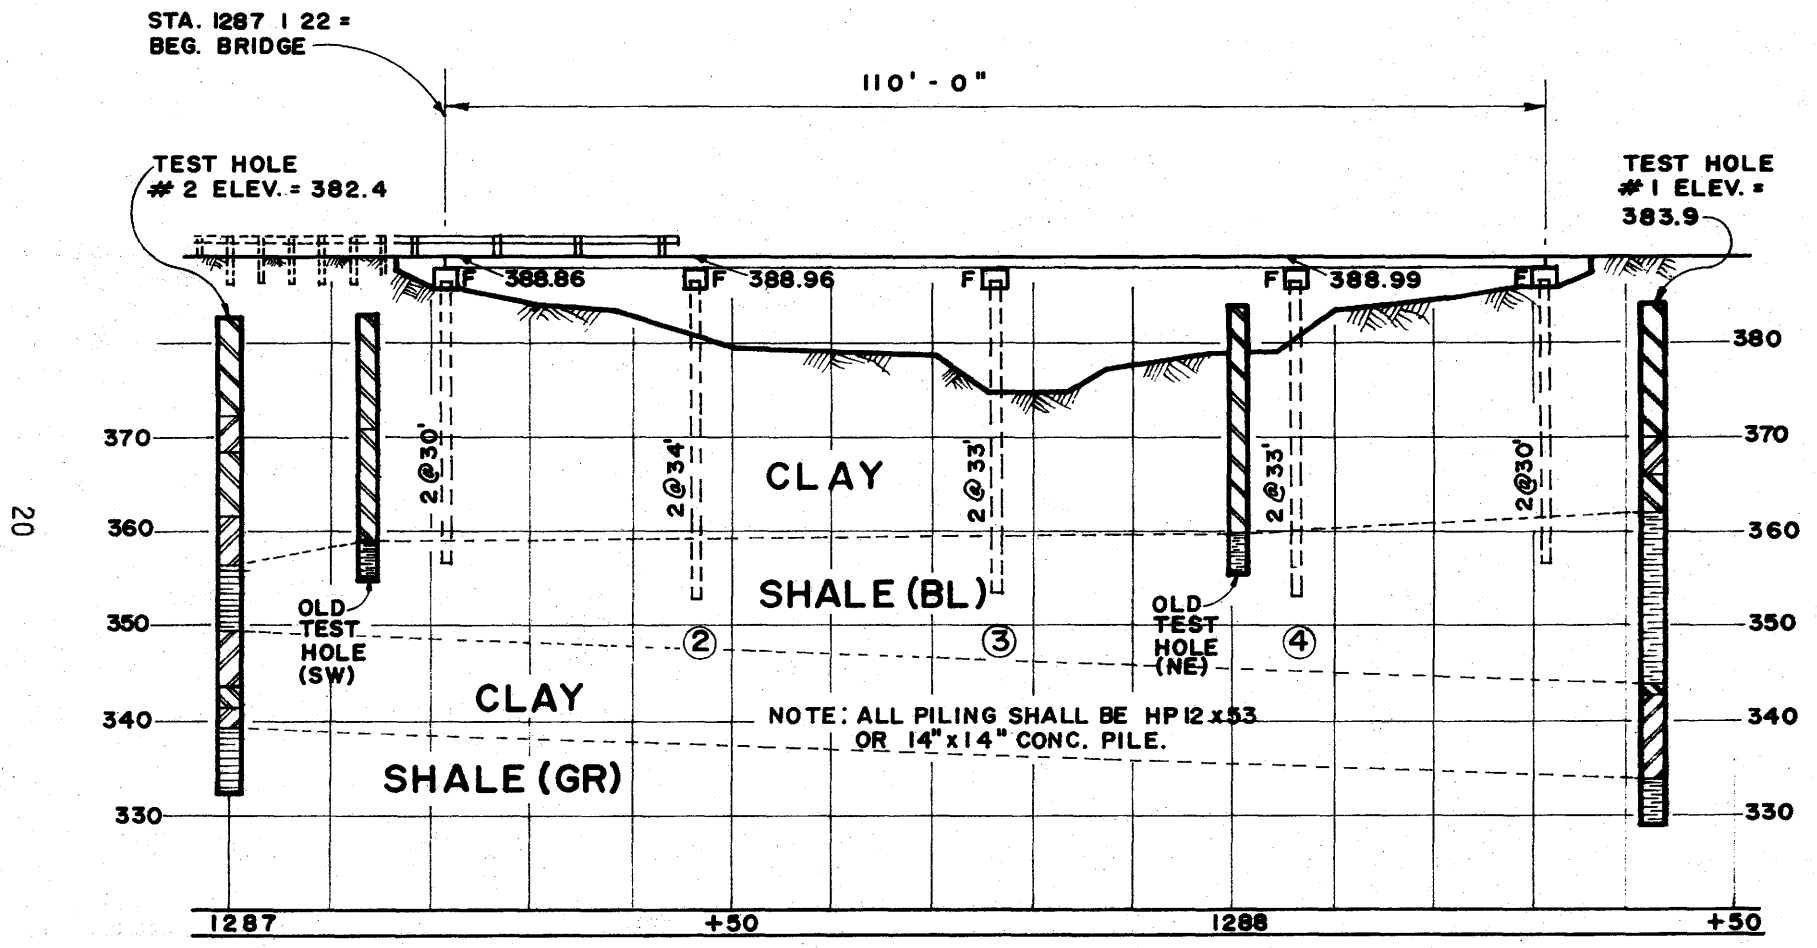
GOUCHY CREEK BRIDGE - FOUNDATION.
